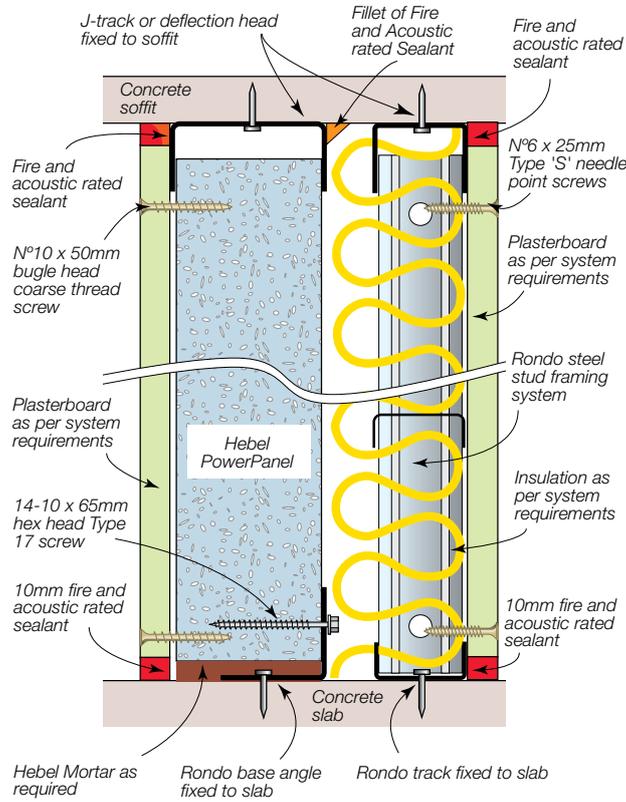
Intertency Wall / Common Wall Option 2 - Vertical cross section detail
